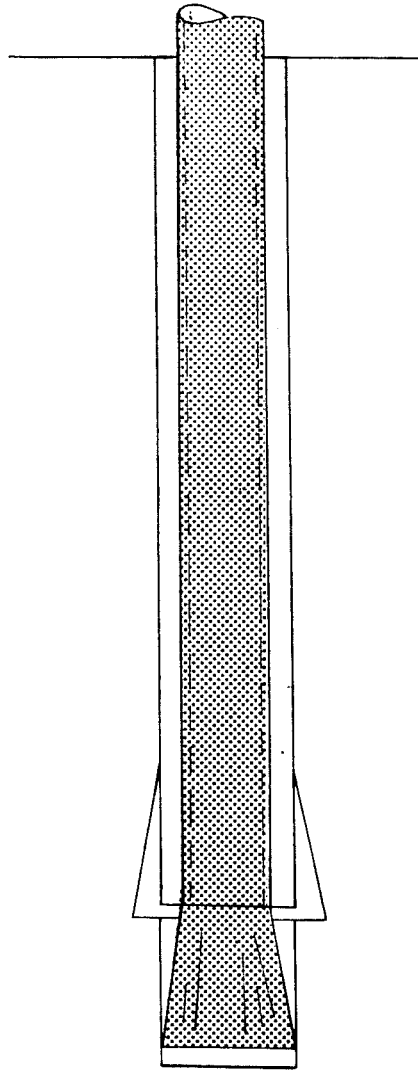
Undercut Hole with Unexpanded Undercut Anchor
